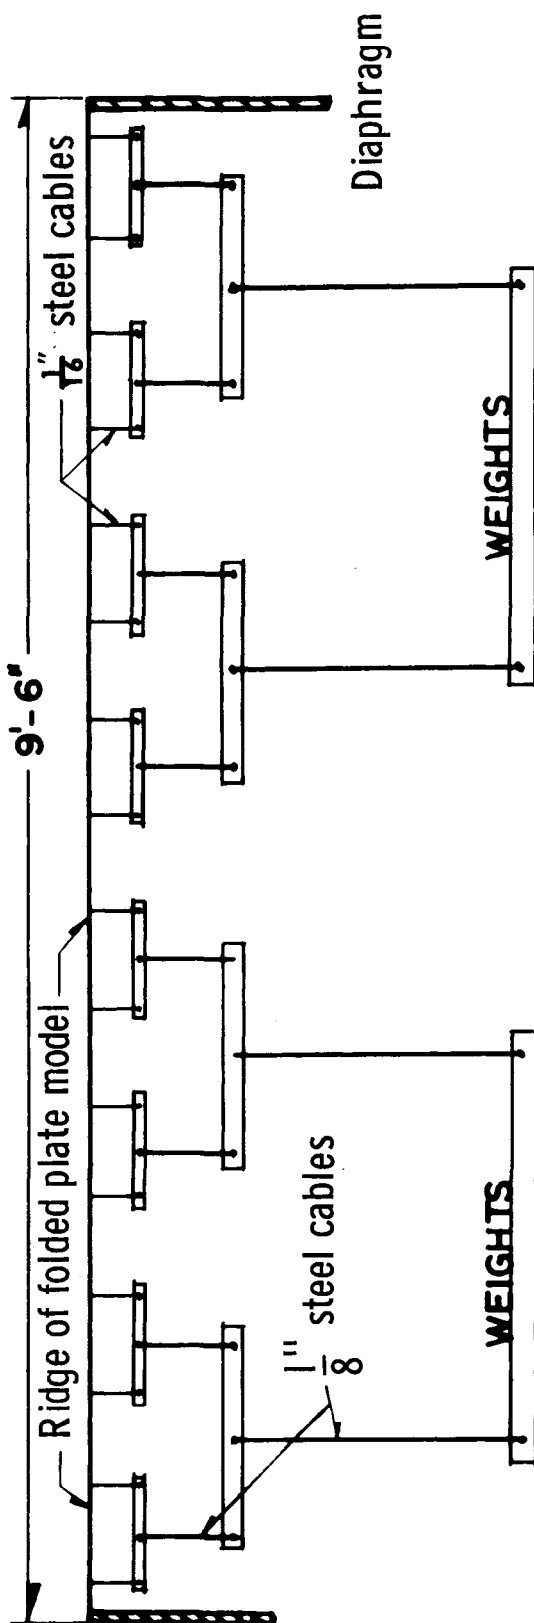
TYPICAL LOADING TREE SUSPENDED AT THE INTERIOR FIVE
